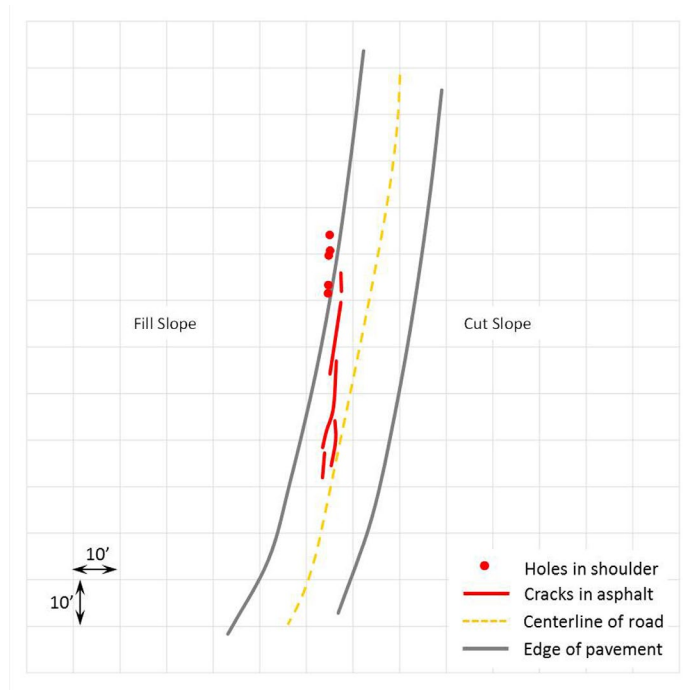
Plan view of distresses at milepost 7.92, Road 17, Siuslaw National Forest.
